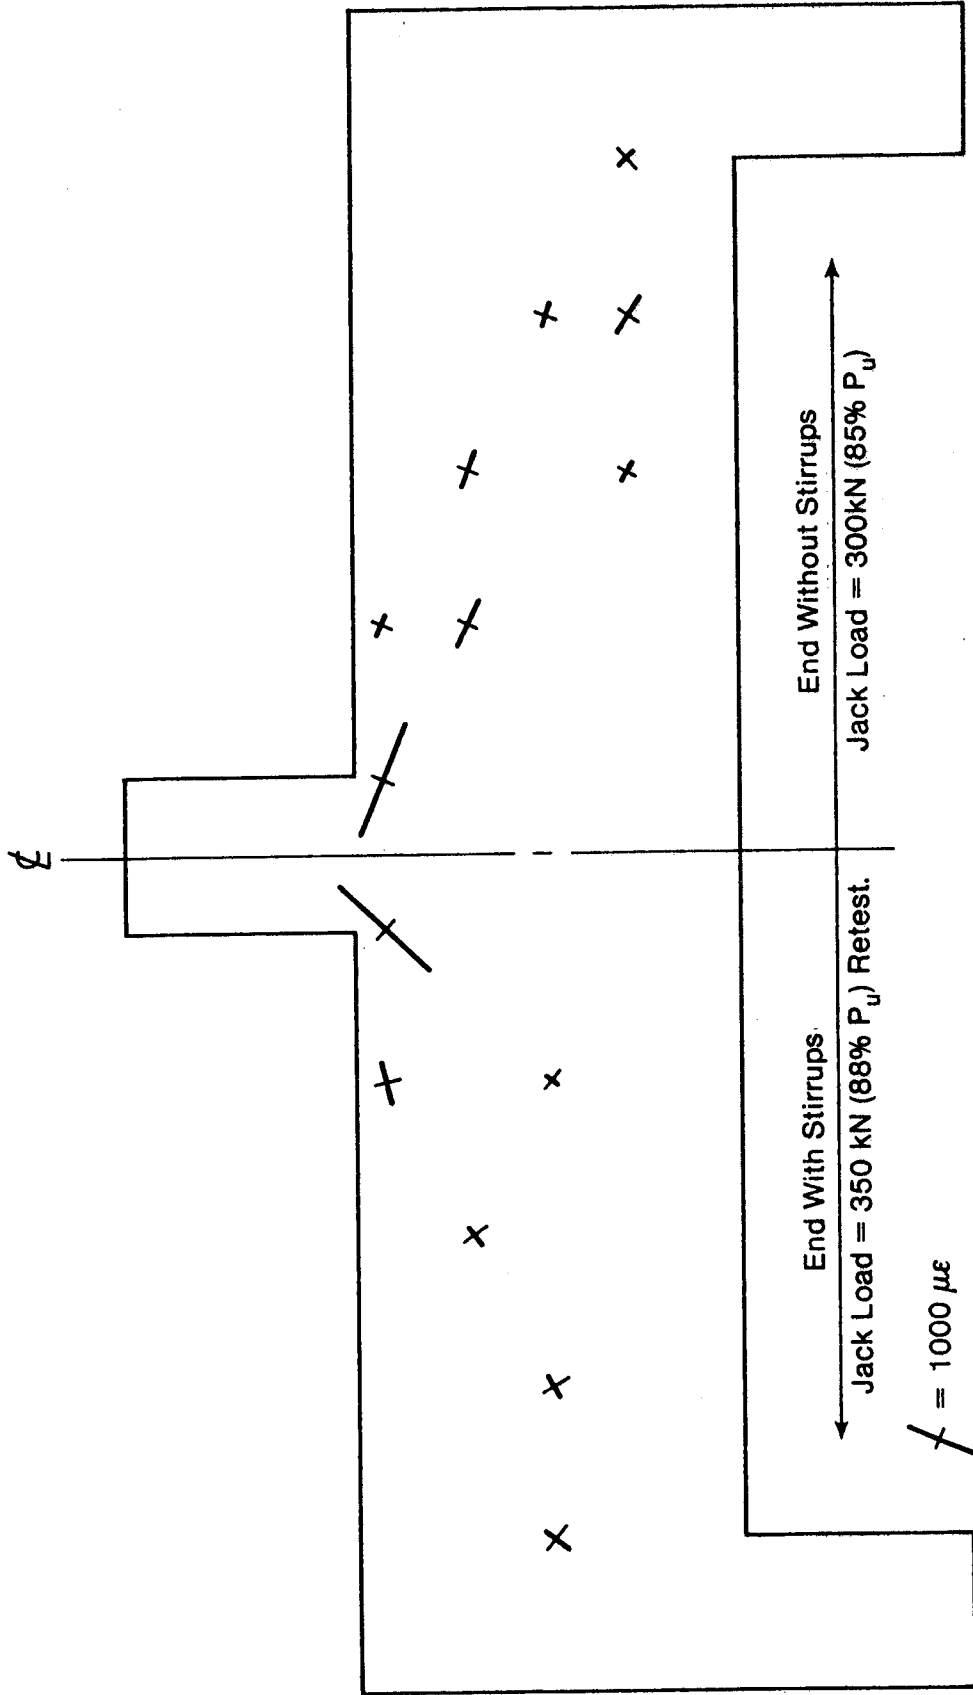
Beam 1/2.0 Concrete Compressive Strains
